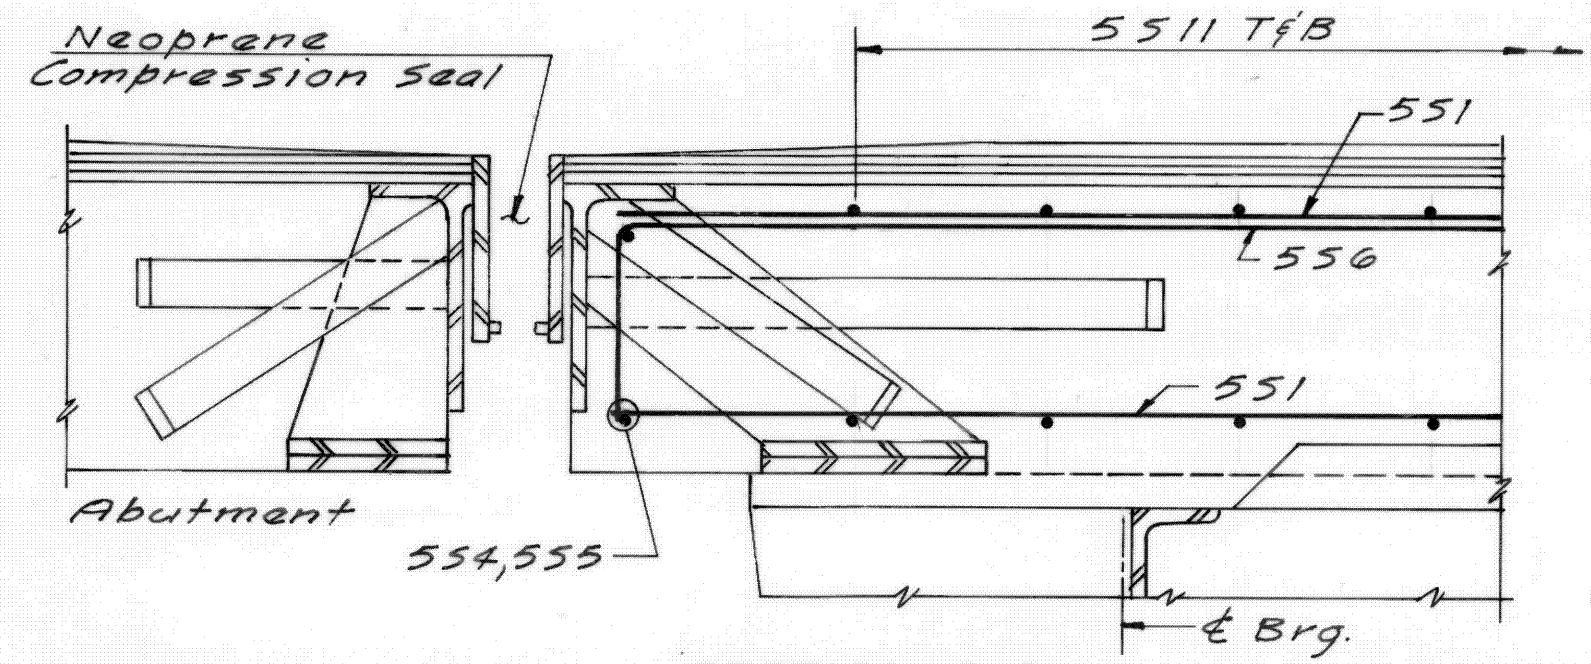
DETAIL AT DIAPHRAGM AND CURB BRACKET
